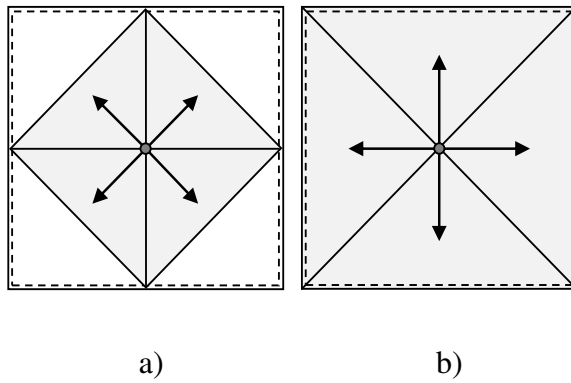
Illustration of the suggested failure modes for a simply supported reinforced concrete slab for load case 1, modelled a) as a beam grillage, and b) with shell elements. The marked area is the load carrying part of the slab.
